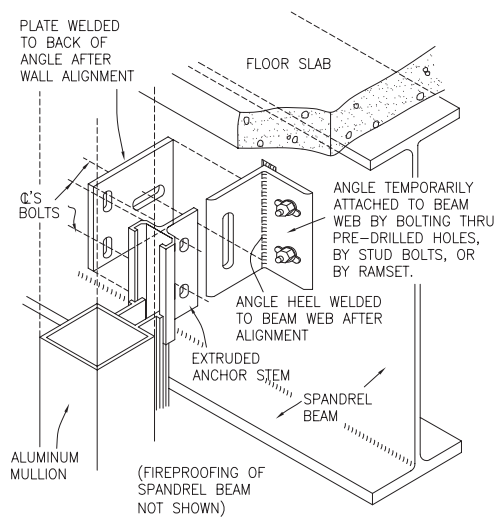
Sample structural steel detail at curtain wall attachment.
